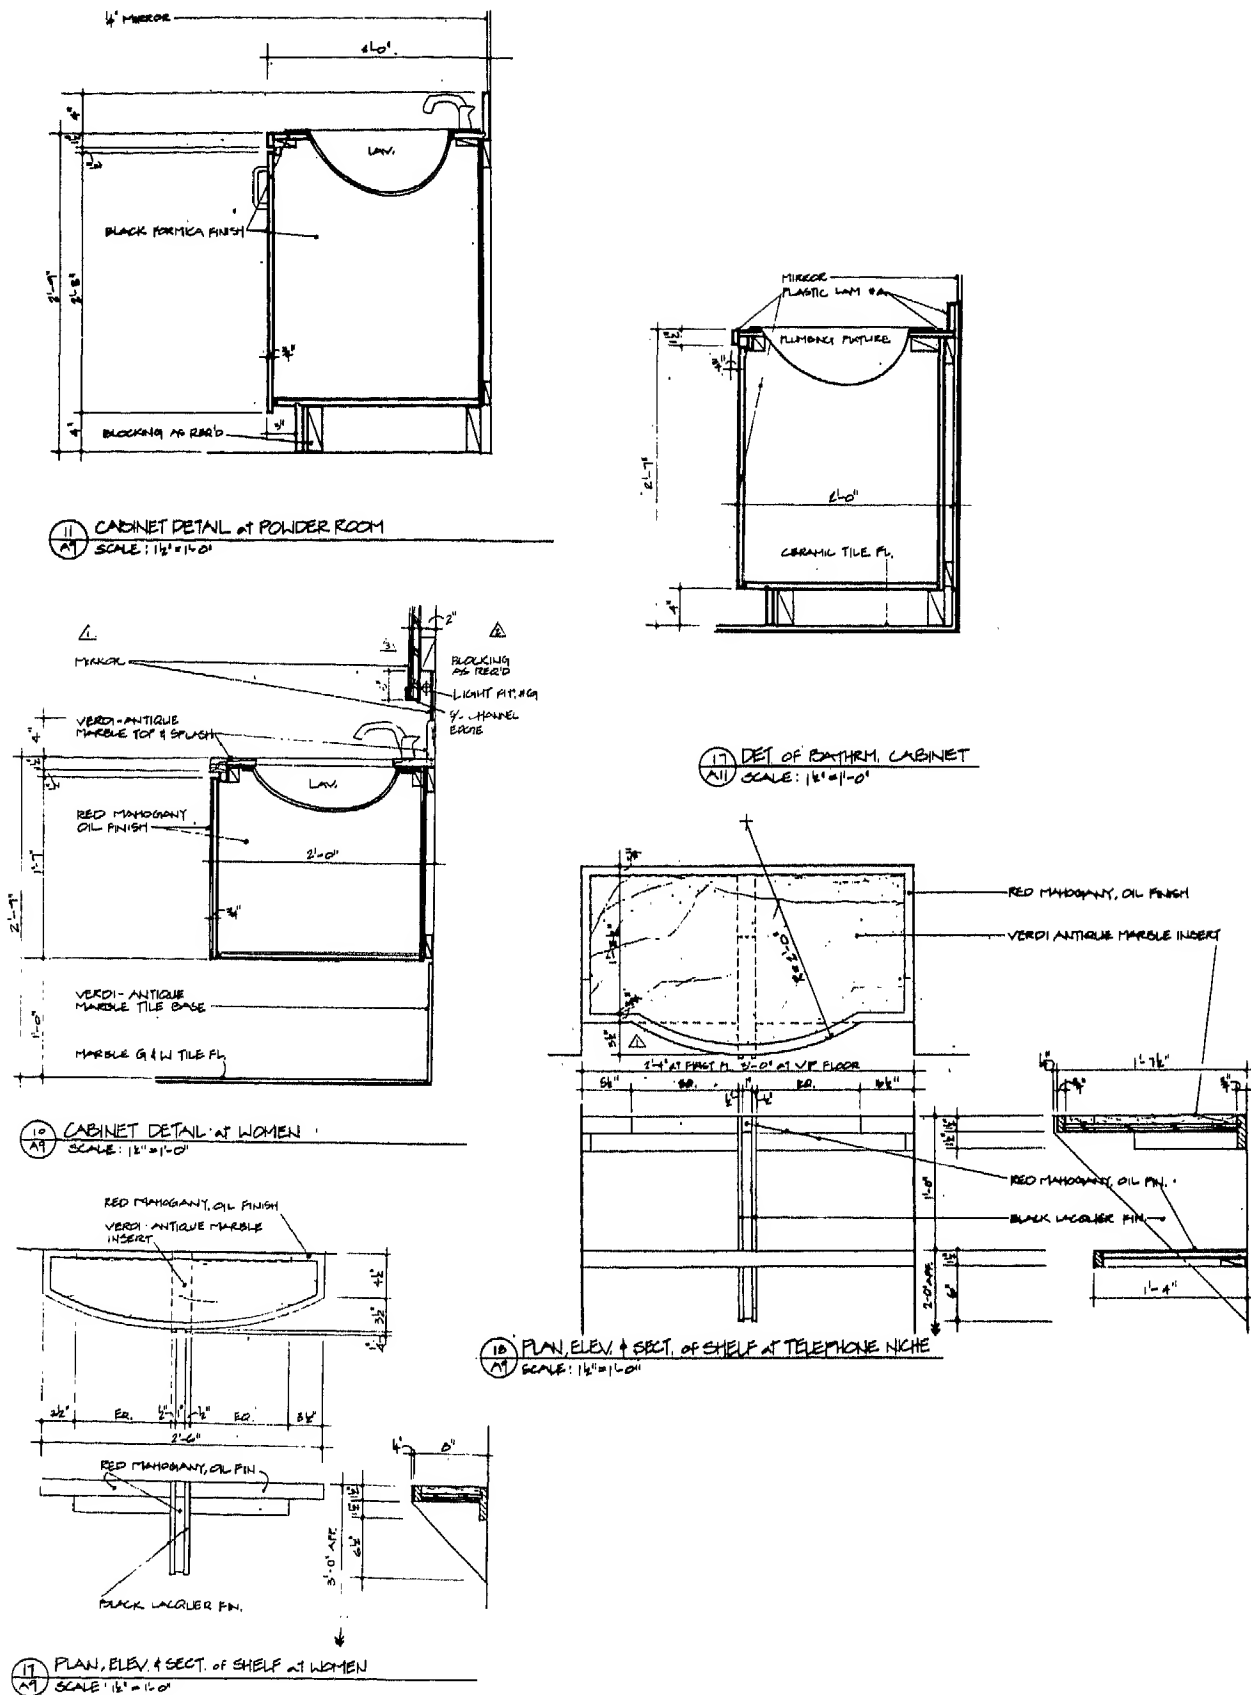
Elegantly detailed lavatory cabinets are shown here. Note the use of an exposed oil-finished red mahogany frame or edge surrounding a verdi antique marble top. Complementary telephone shelf details in plan, elevation, and large-scale detail are also shown.
